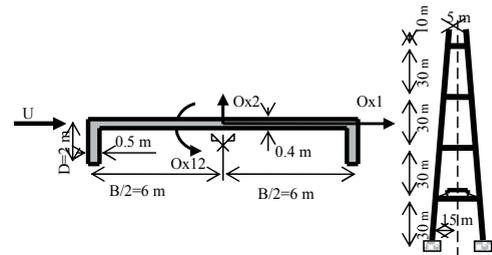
$\Pi$ -shaped cross-section and pylon of the cable stayed bridge.
